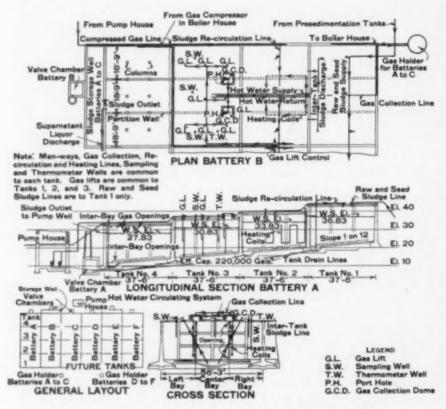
Typical Plan and Sections of Sludge Digestion Tanks
